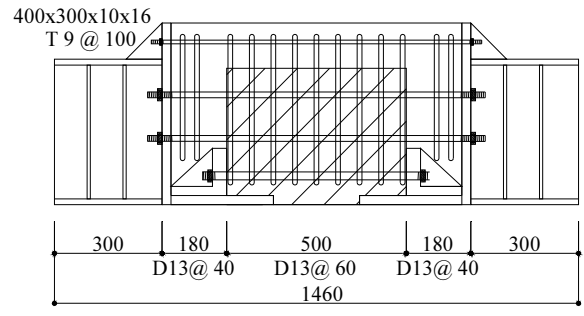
Details of one-way shear specimen and reinforcement arrangement (unit: mm)
